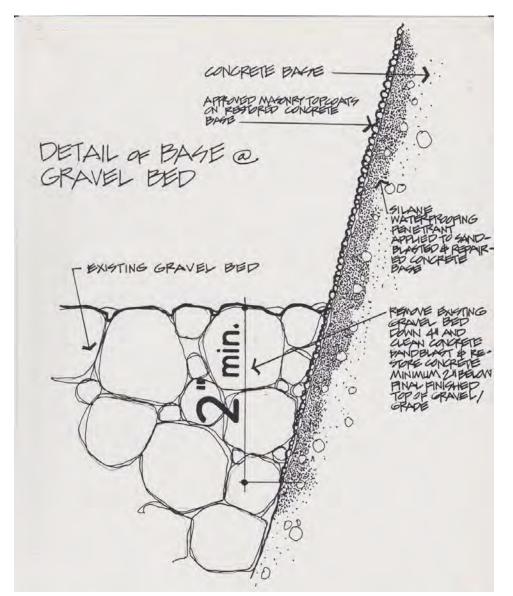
1986 Construction Detail at Base at Gravel Bed. Eberson and Toto, Detail 3/5. This construction is no longer visible at the perimeter of the Sanctuary.
